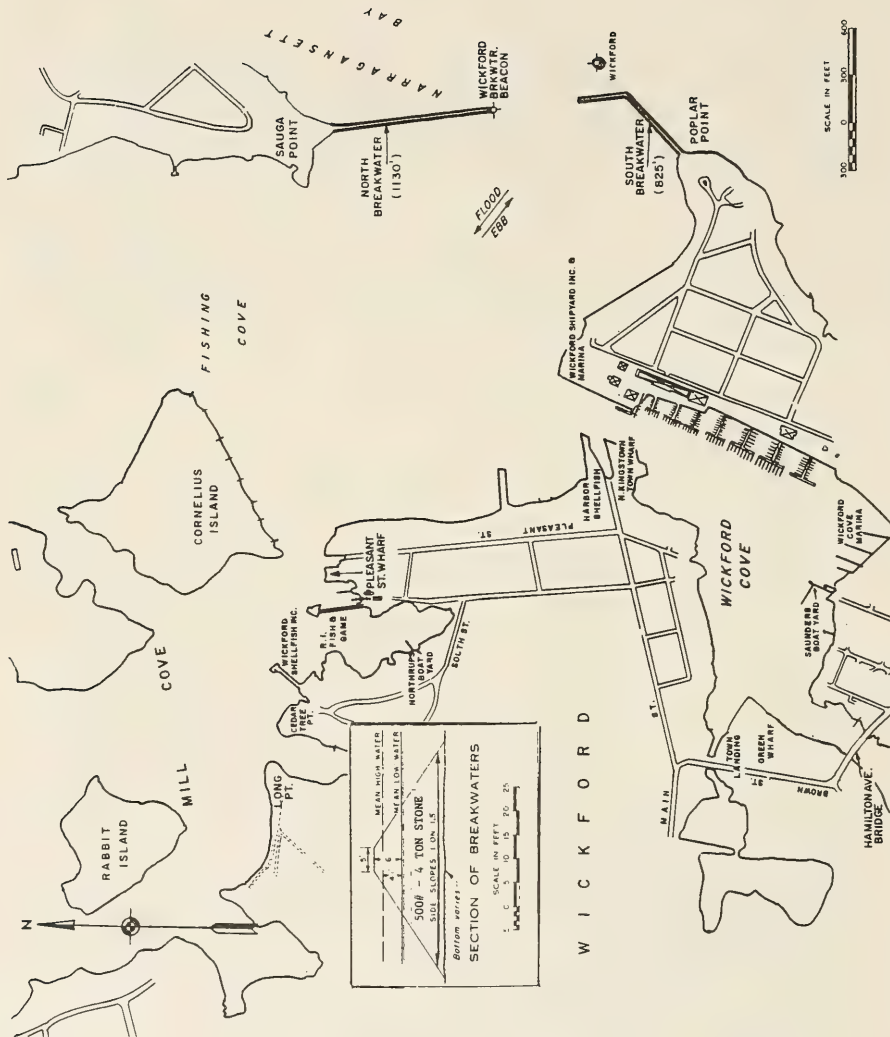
Plan view and typical section of breakwaters at Wickford Harbor, R.I.
